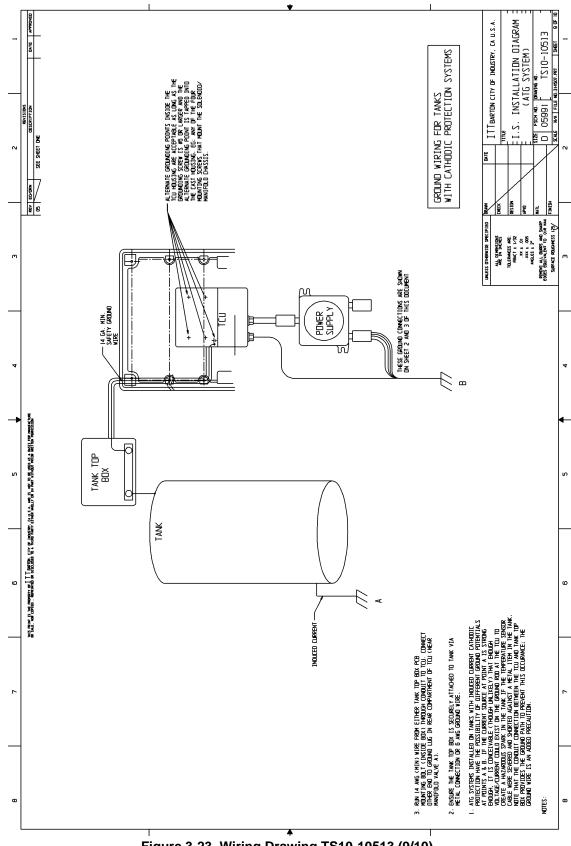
Wiring Drawing TS10-10513 (9/10)
